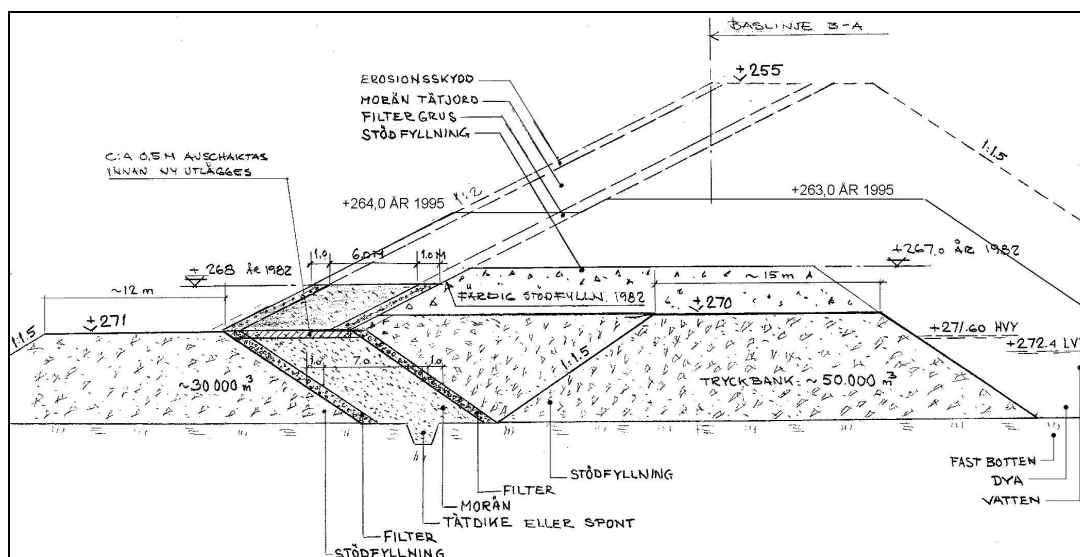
Cross-section of Malmberget tailing dam [49, Iron group, 2002]
